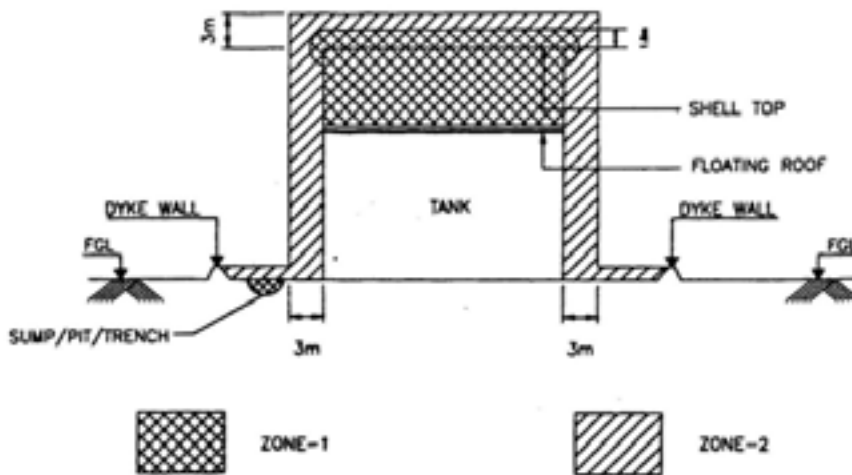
TANK WITH FLOATING ROOF WITH OR WITHOUT PROTECTIVE CONE ROOF
